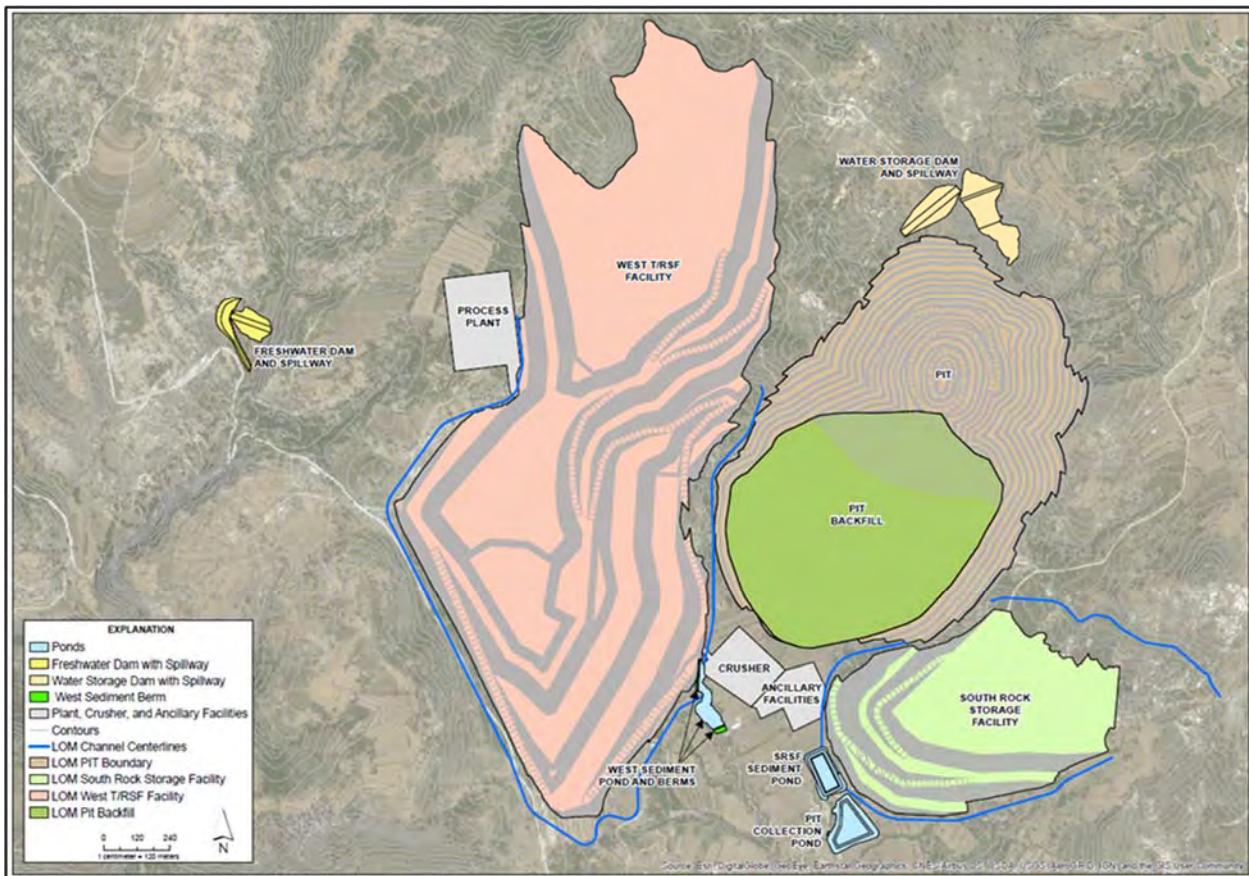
West Tailings and Rock Storage Facility General Arrangement - LOM
